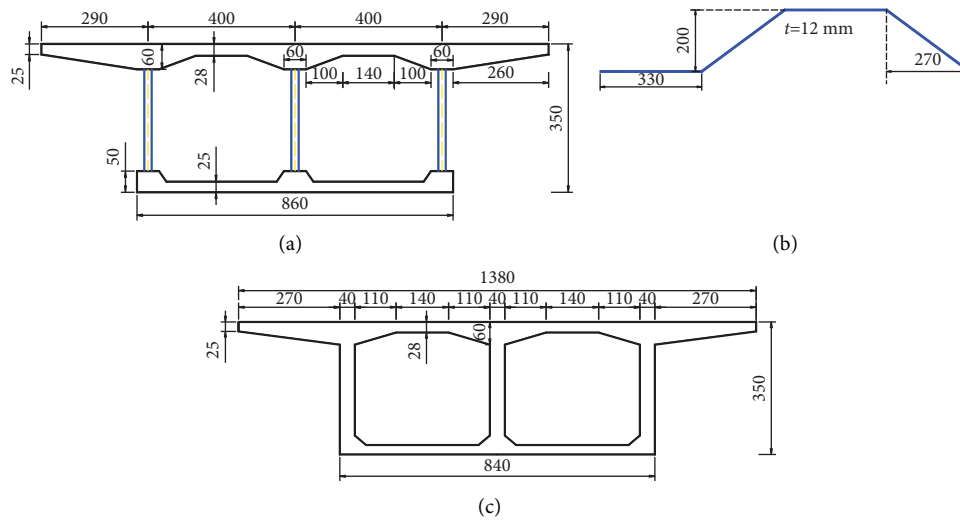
Schematic of the box girder section: (a) section of the composite box girder with corrugated steel webs (cm), (b) detail of the corrugated steel web (mm), and (c) reinforced concrete box girder section (cm).
